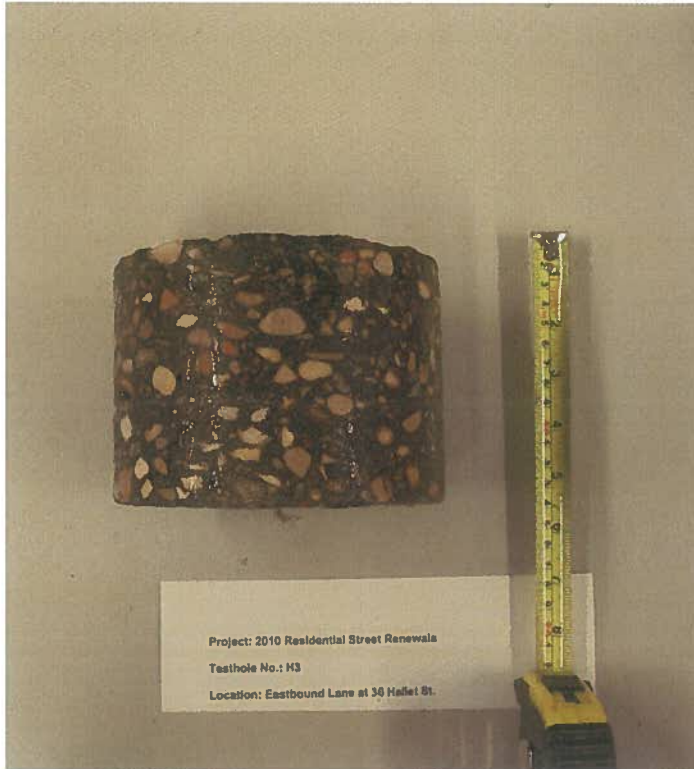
Test Hole H3: 36 Hallet St., Eastbound Lane, 55 m E of W sidewalk at Rover Ave., 1.9m N of S curb
